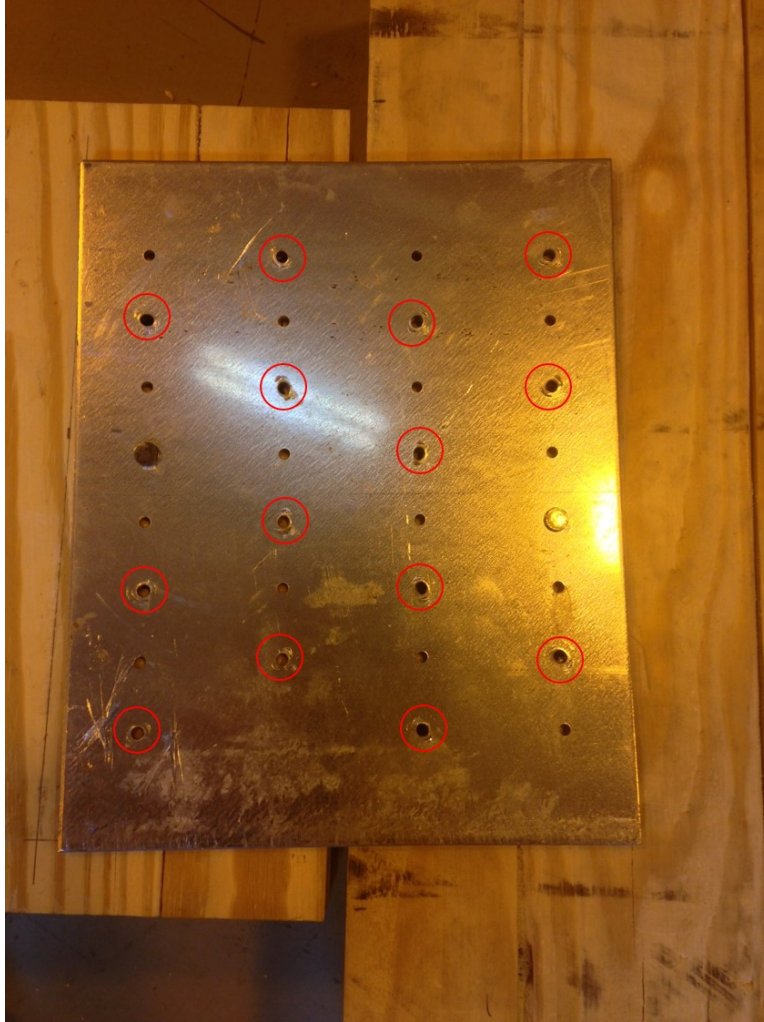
Photograph of Nail Head Shear-off in Cyclic Steel Plate Specimens
